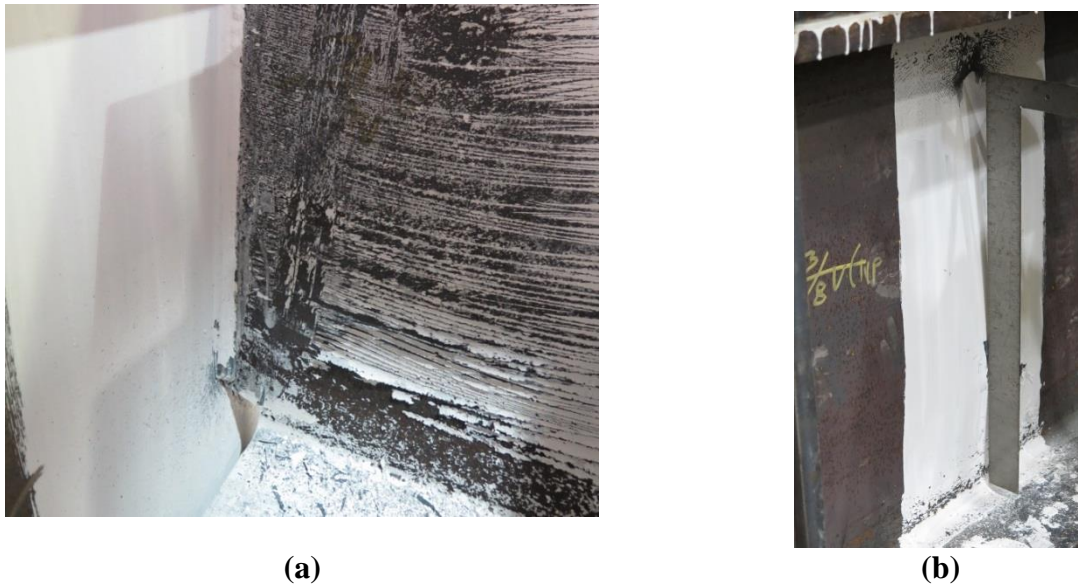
Punching damage in Specimen 10 (a) bottom of beam connecting into girder; (b) back of girder web
